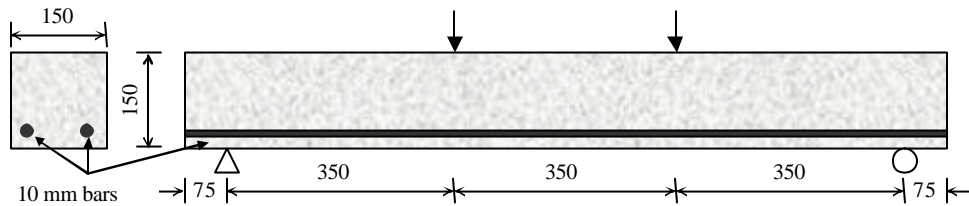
Geometrical and reinforcement details of the specimens (Unit: mm)
